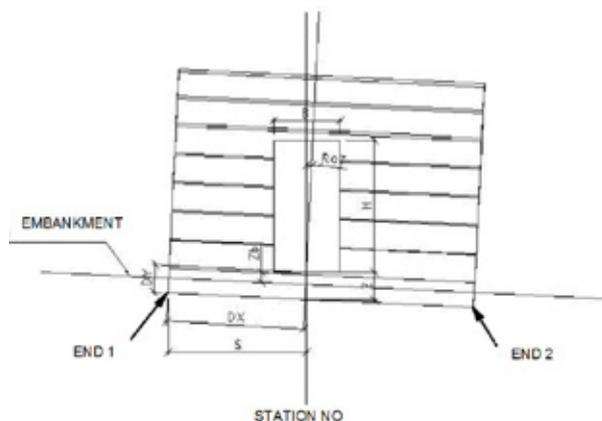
From Novapoint User Manual for Concrete Wall elements.
